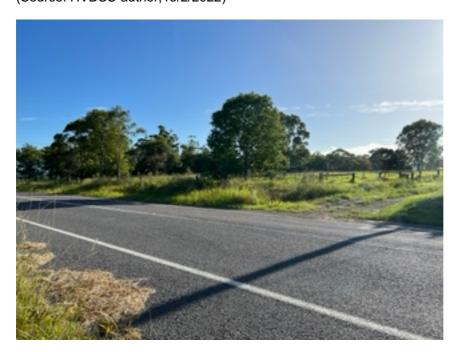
Looking at the southern connection of the existing to proposed Subdivision (Source: HVBCS- author, 15/2/2022)
